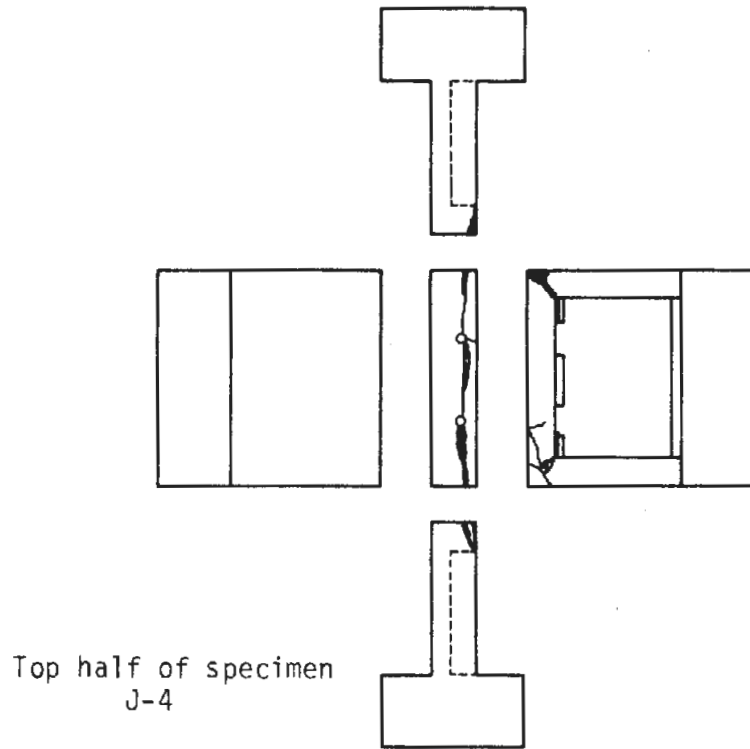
CRACKING OF SPECIMEN J-4 AFTER TEST
